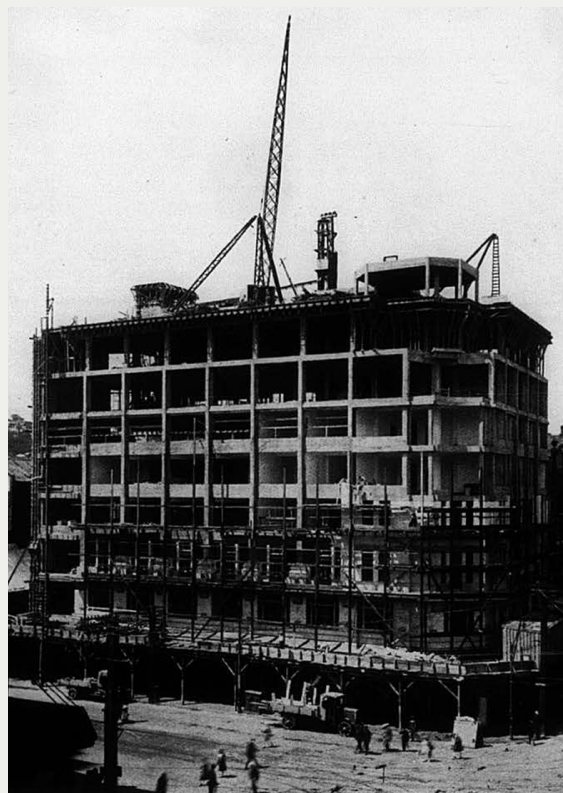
The Dilworth Building, N.Z. *Architectural & Building Review*, January 31, 1927. The structure can be seen behind the stone façade.
